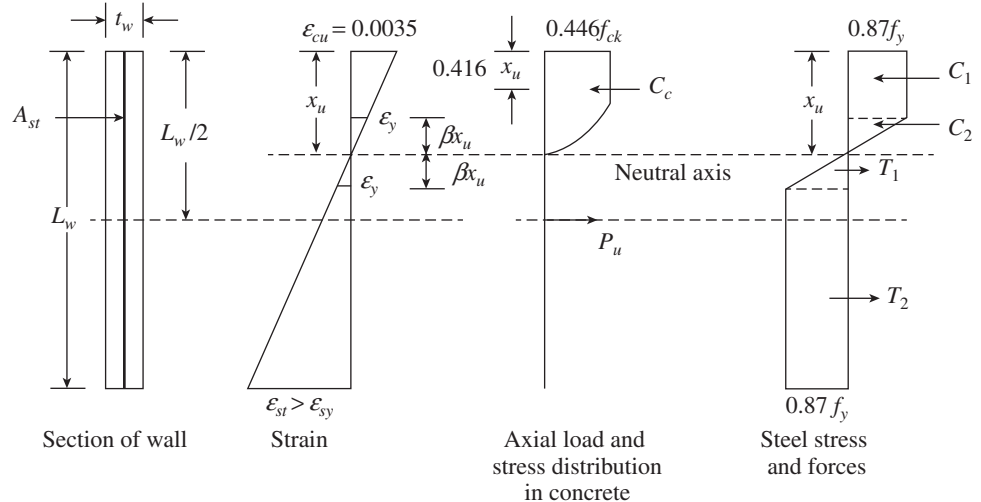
Stress-Strain distribution in structural wall (flexural tension failure)
